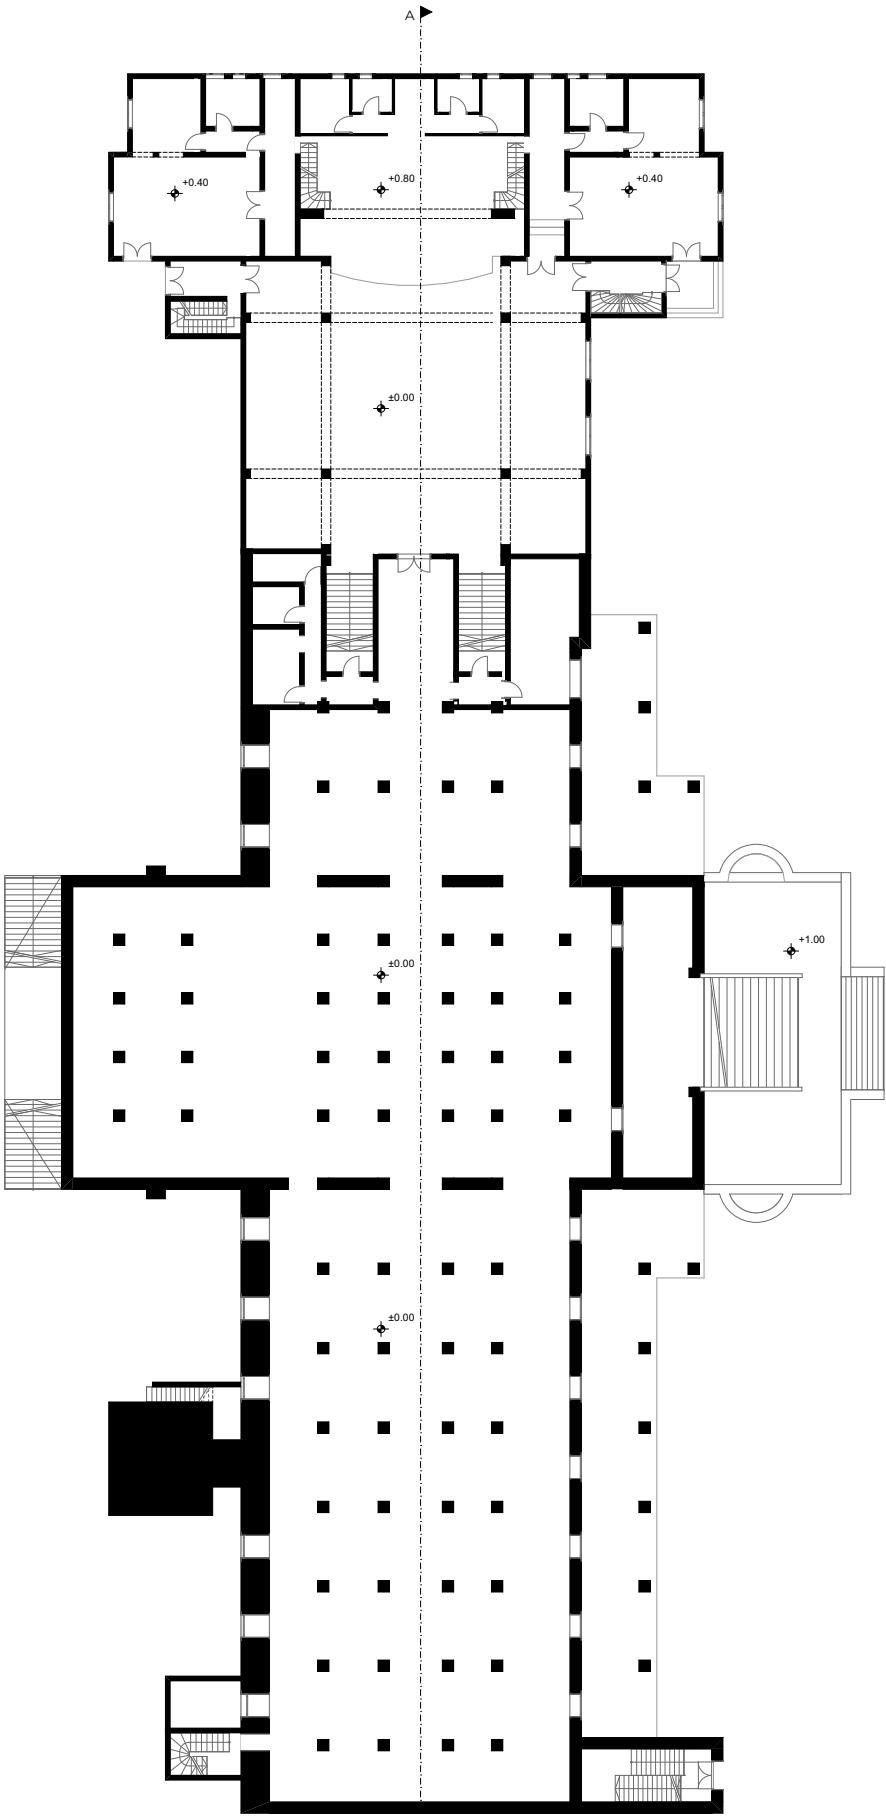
Basement Floor Plan, (Source: Created by the author, 2024)
